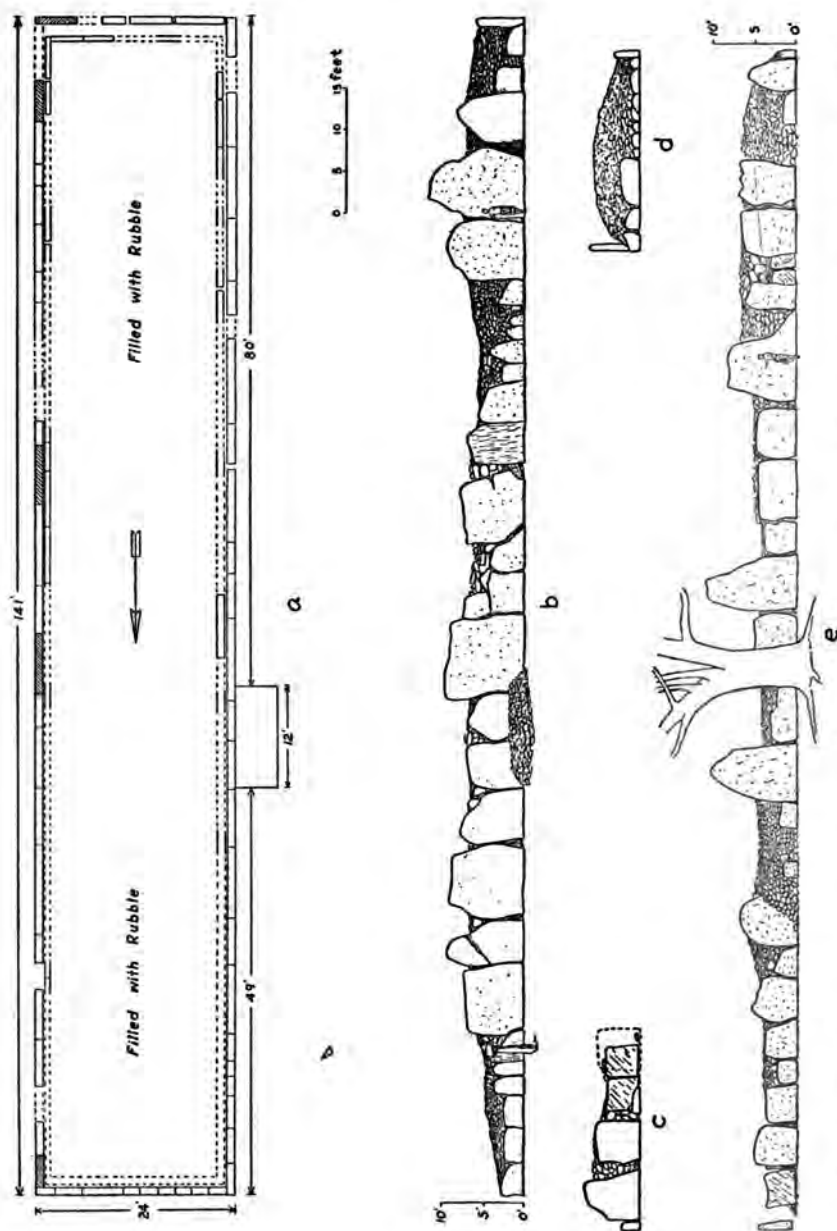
Plan and elevation of marae Taputapuata (Site 186) : a, plan, showing length and position of all visible slabs, shaded rectangles represent slabs now fallen; b, west face, two basalt slabs shown by vertical shading; c, south end; d, north end; e, east face.
